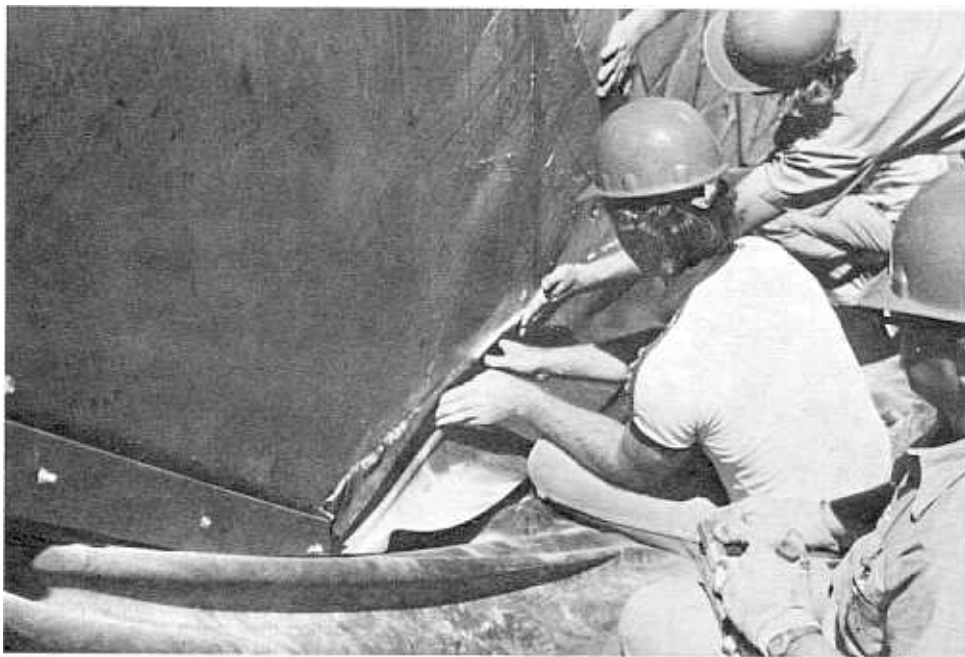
Attachment of membrane lining to inlet-outlet structure using contact adhesive. Photo P-382-706-28460 NA
